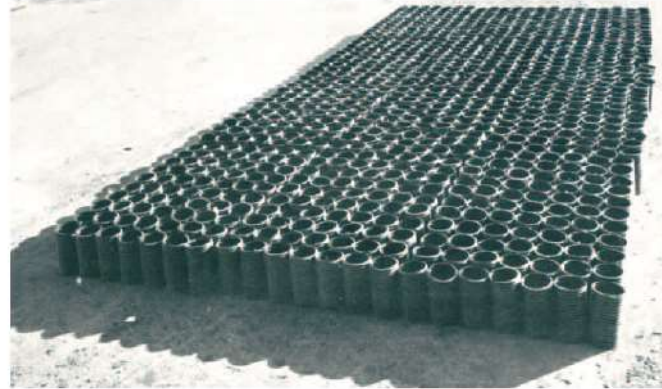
Corps of Engineers geocell test section, Vicksburg, 1977.
